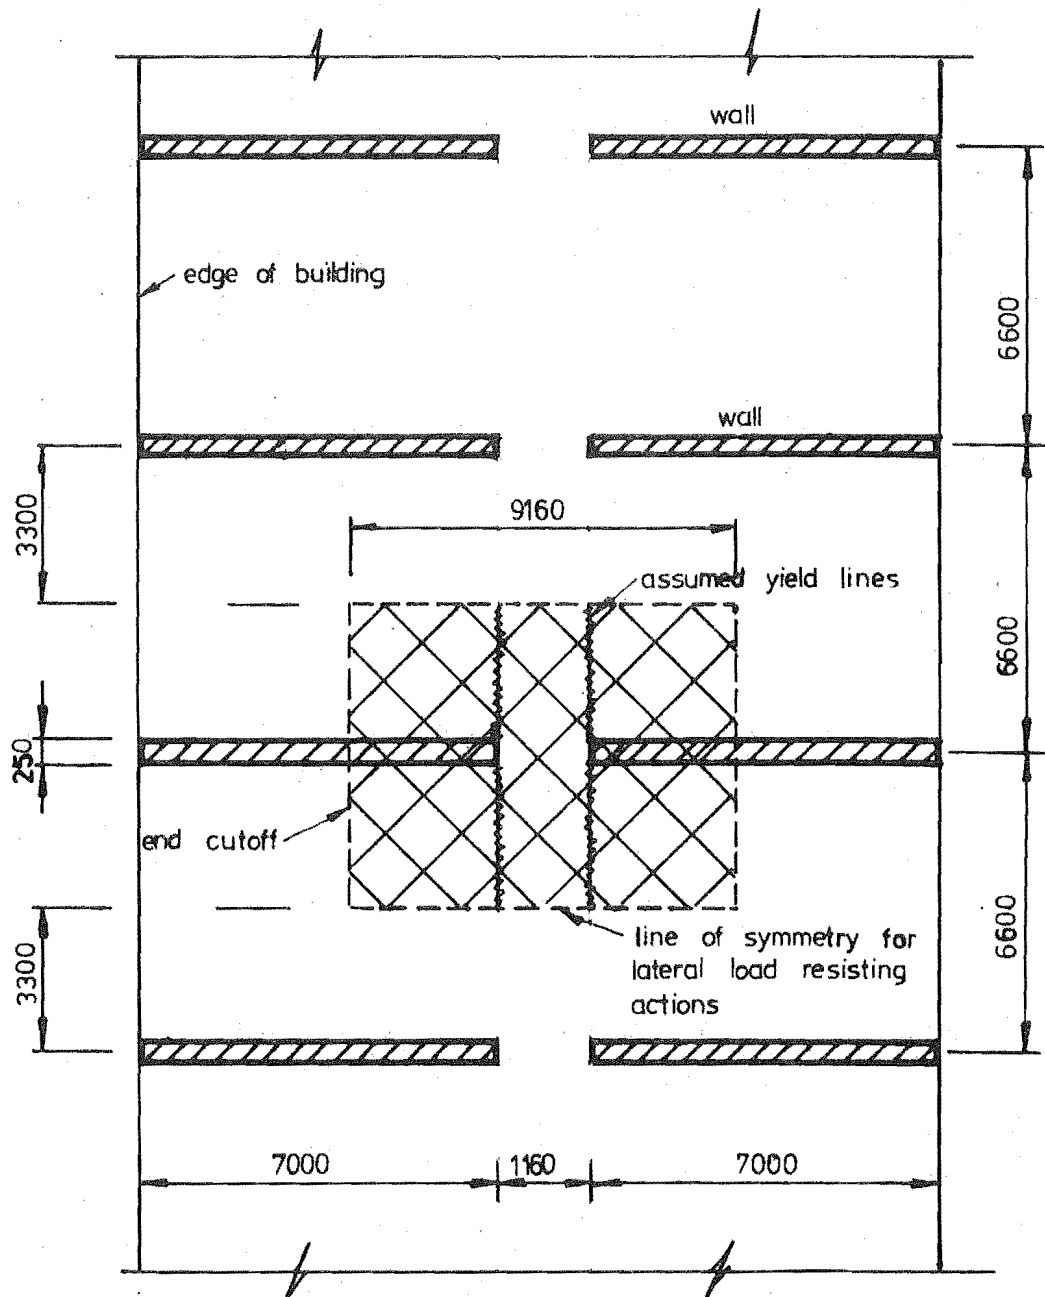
PLAN OF THE PROTOTYPE STRUCTURE
